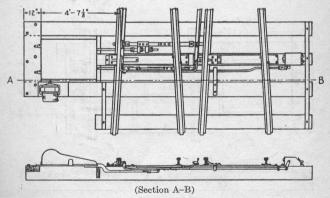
Single Slip Switch Operated by Model 2 Switch Machine
